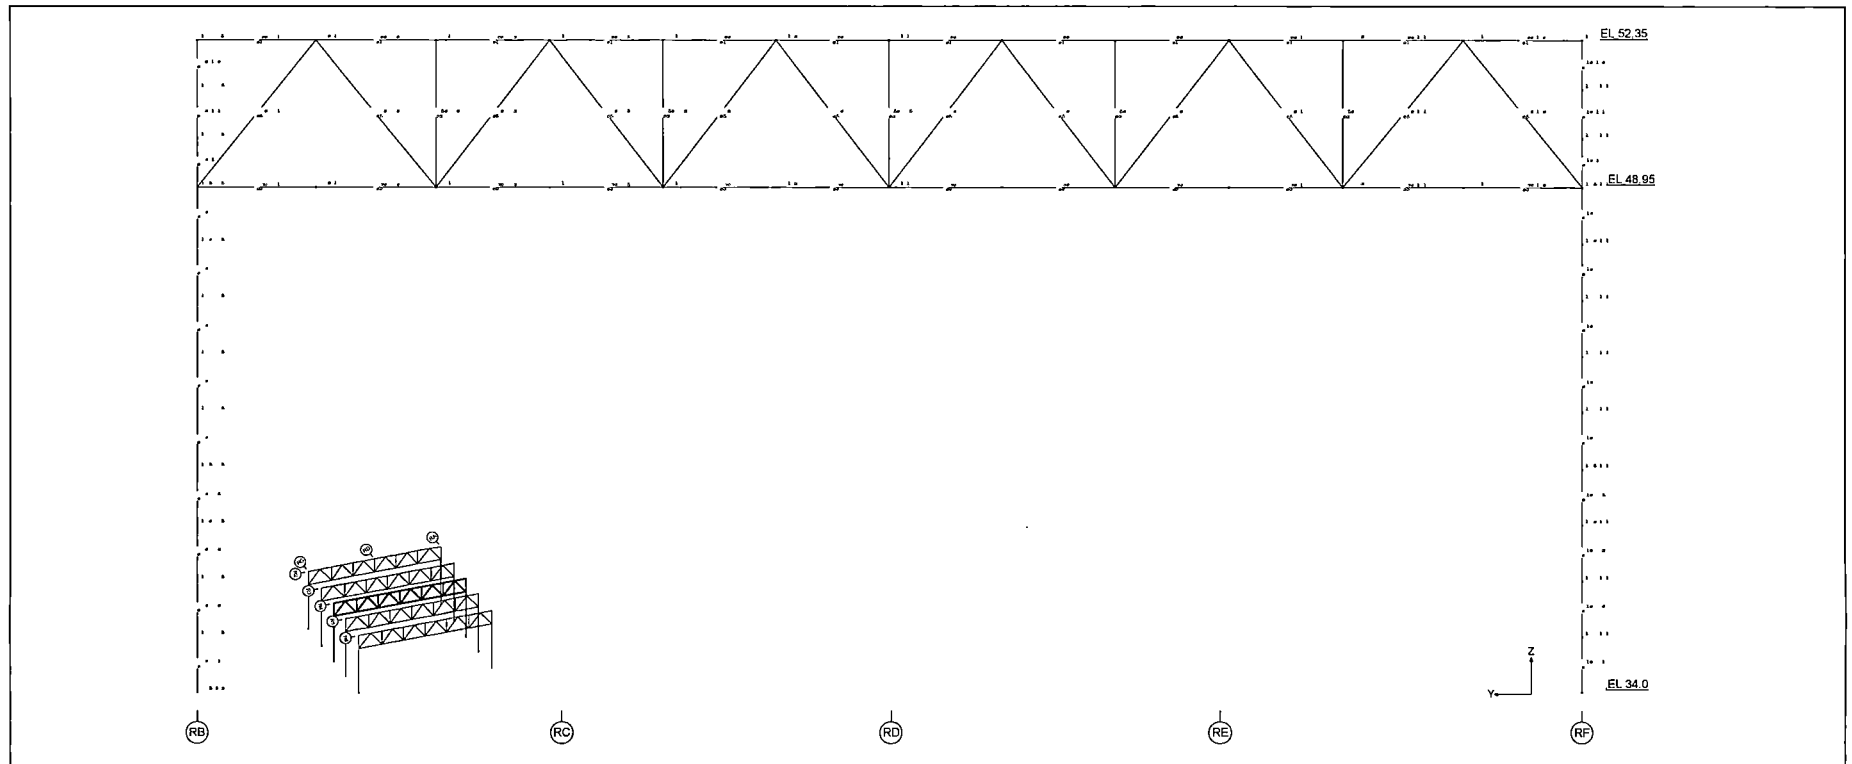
FE Model of the Roof Truss (R4 Column Line)
